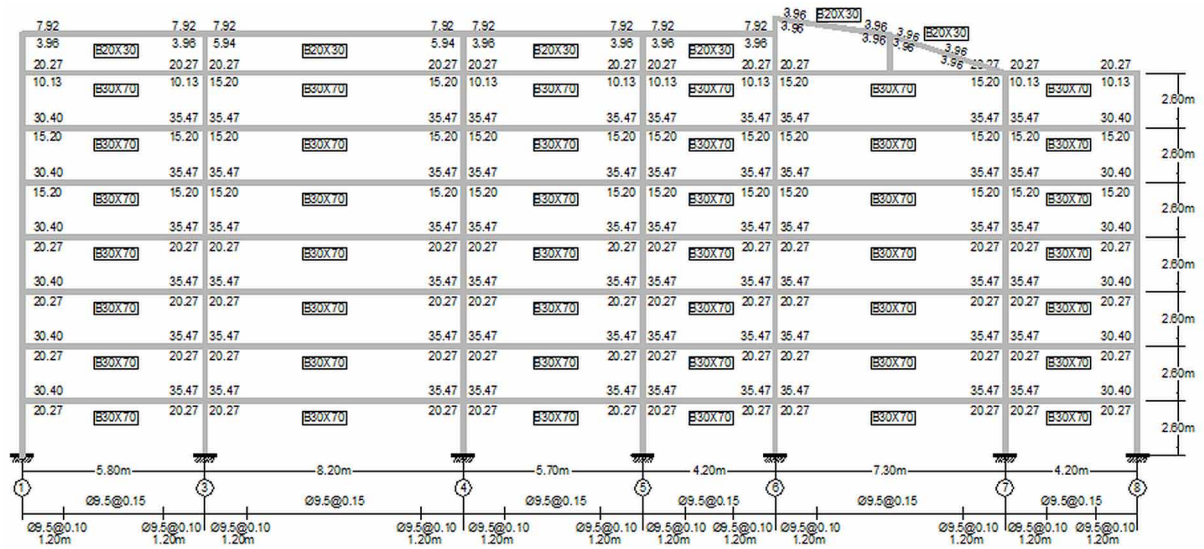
Residential building, geometry and reinforcement in columns of the frame D
